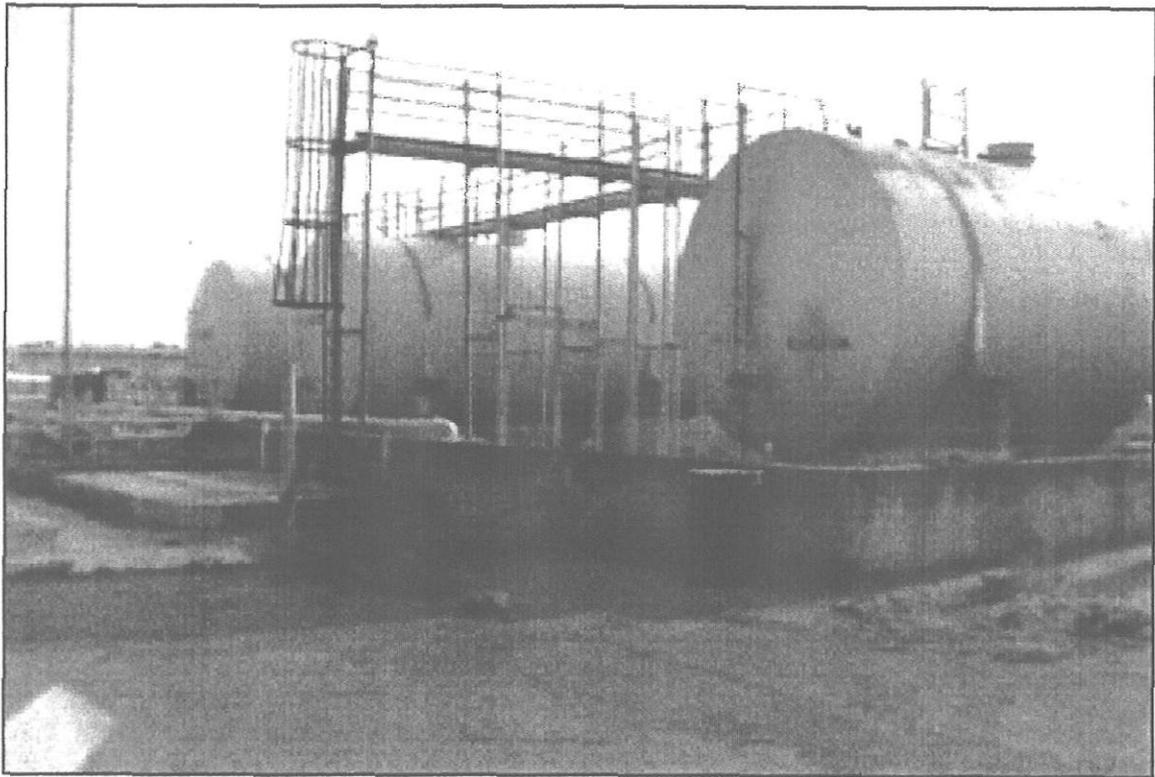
CAA 11, Area 37 - View looking southwest of the three 25,000-gallon ASTs and secondary containment structure.
